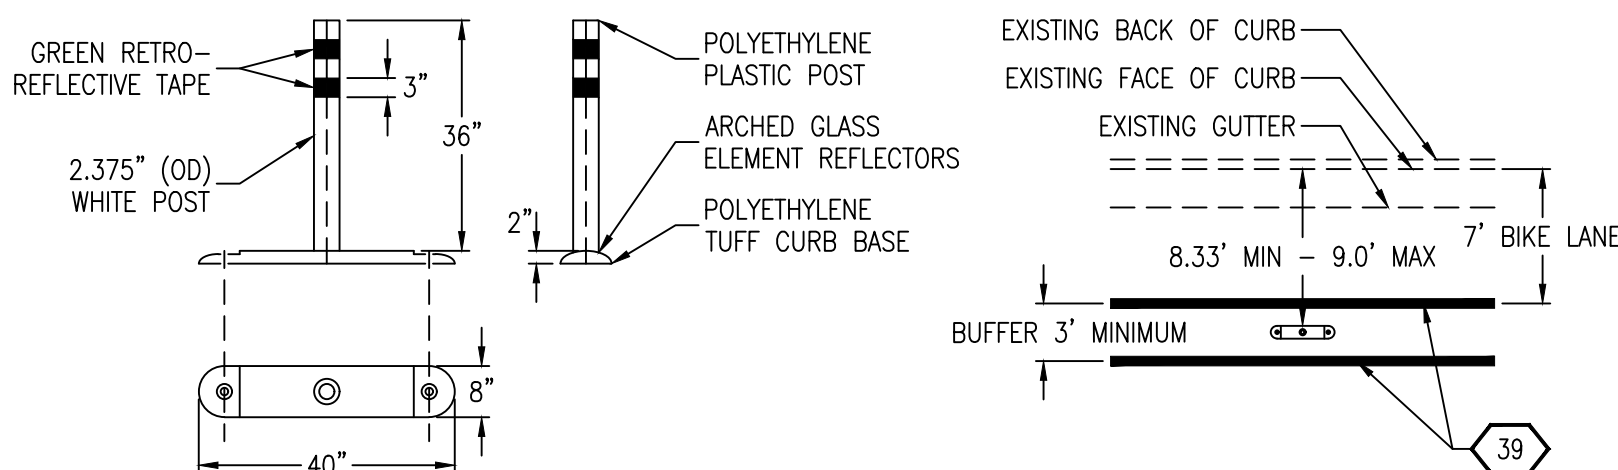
CLASS IV DRIVEWAY OPENING
